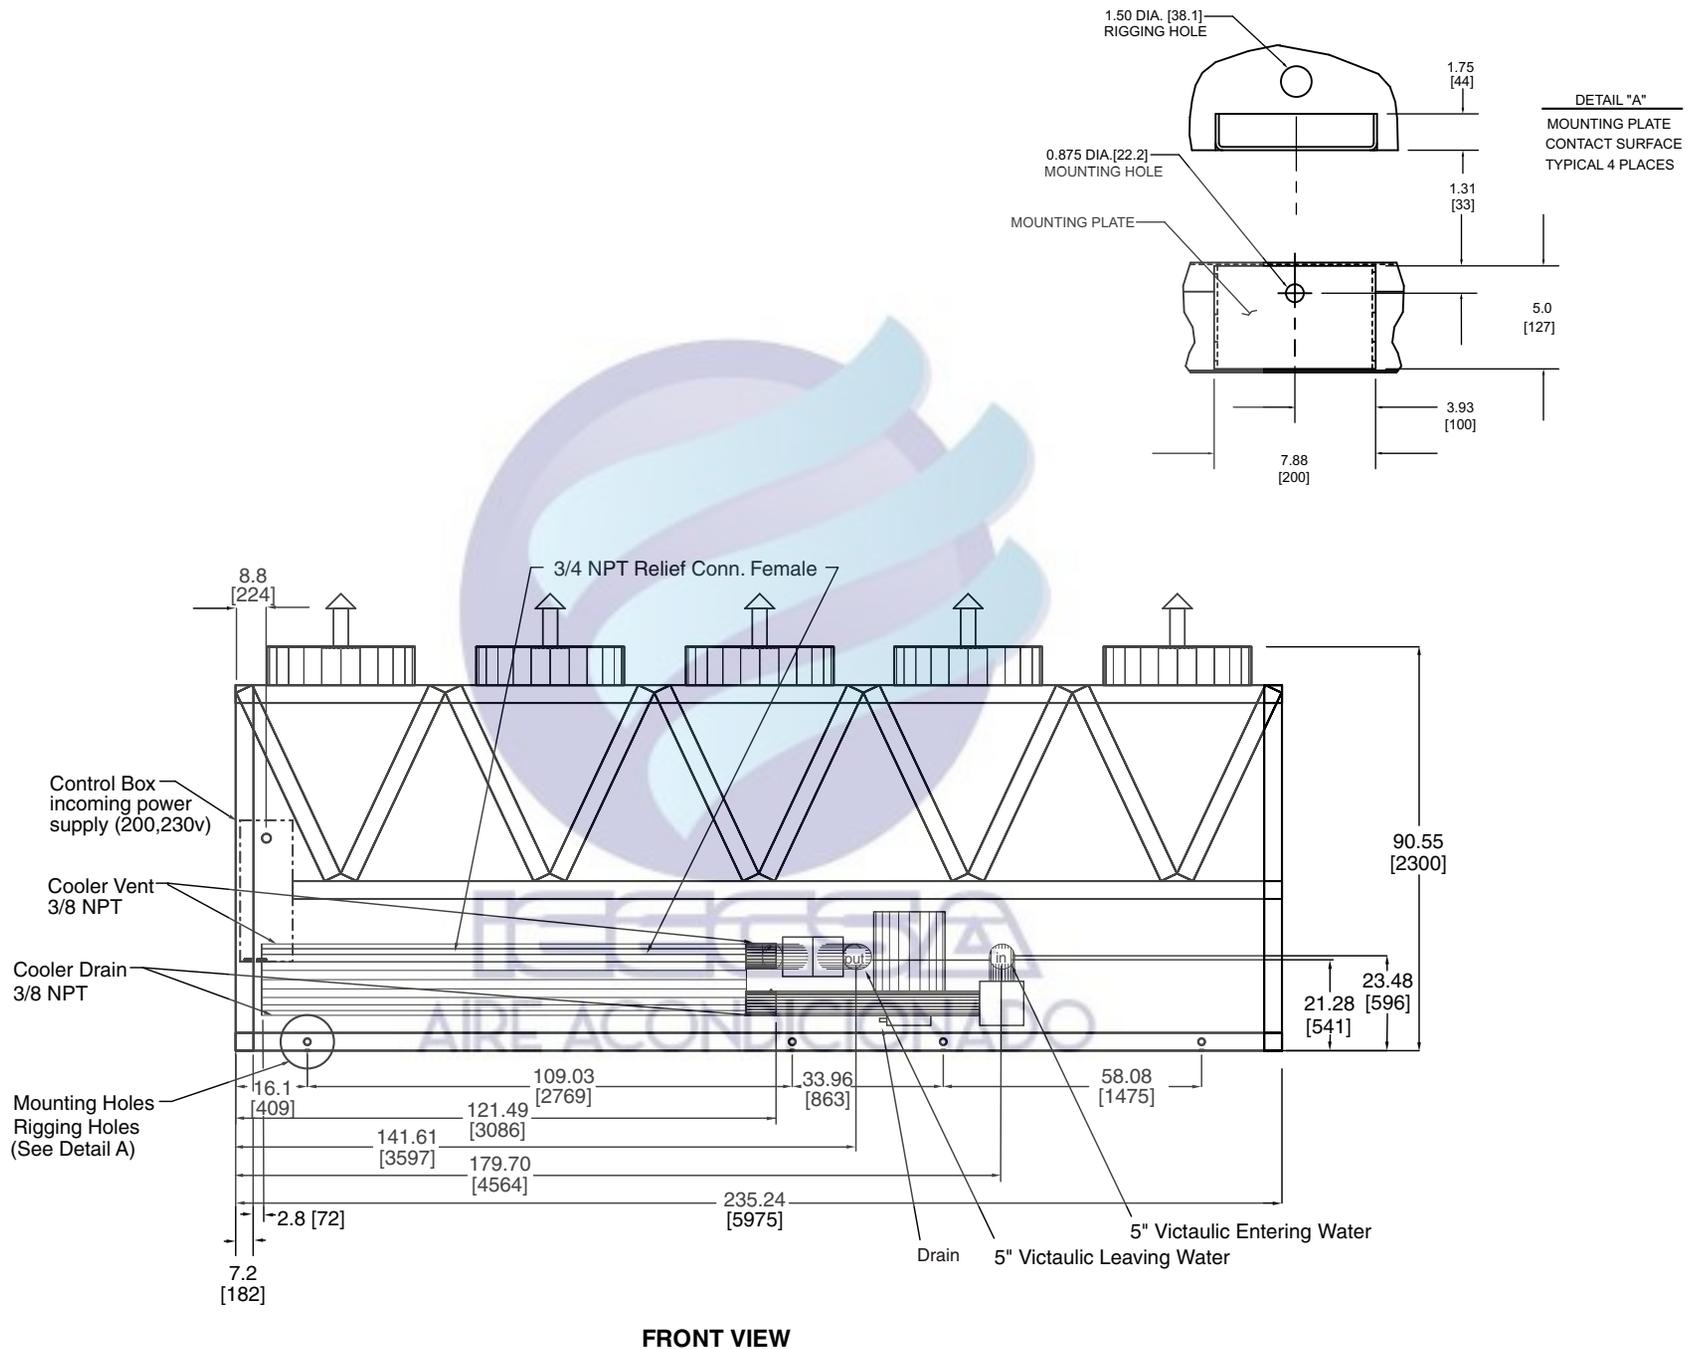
30XA140,160 Air-Cooled Liquid Chiller Dimensions with Dual Pump (cont)
